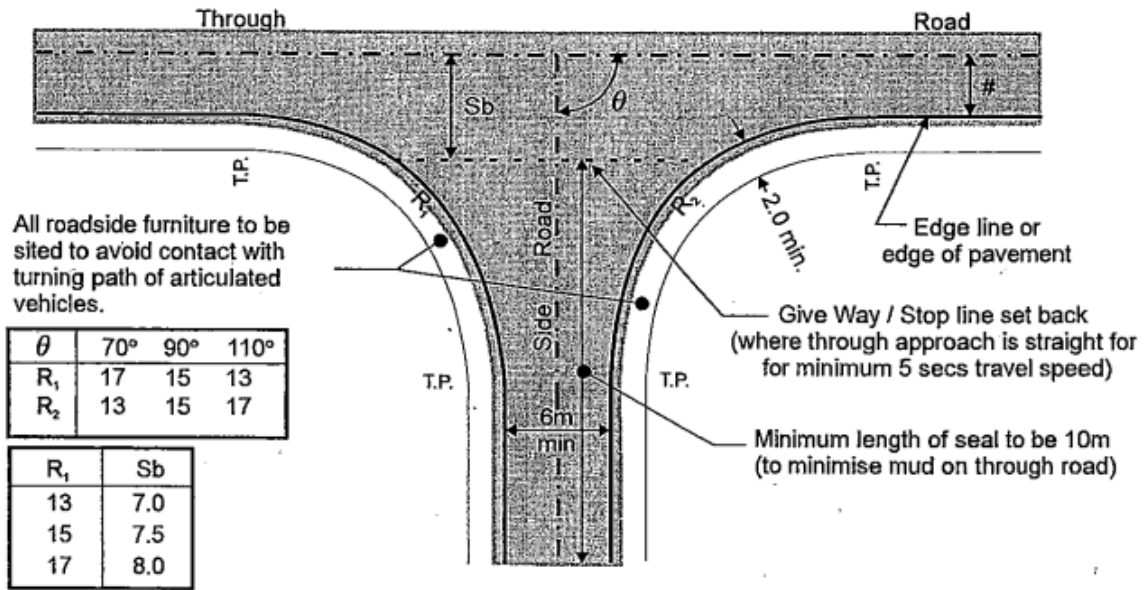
Details of Type "BAL" Layout for Rural Sites where Side Road AADT < 50.
